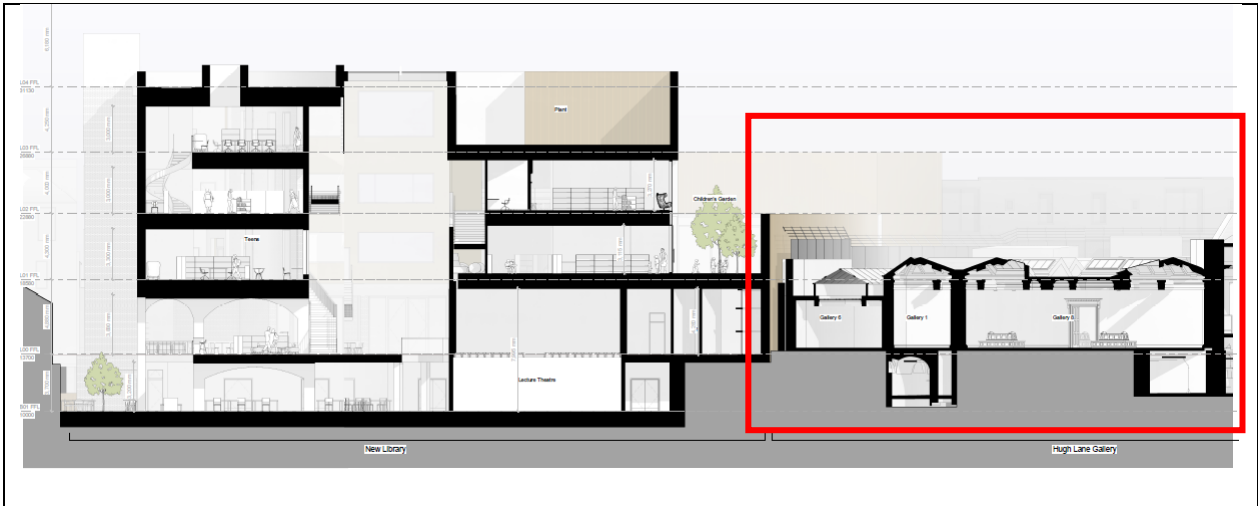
Partial Section Proposed, E-E from Section 146B Planning Drawings for Parnell Library, showing Hugh Lane Gallery to the right hand side and faded projection view of new Parnell Library.
